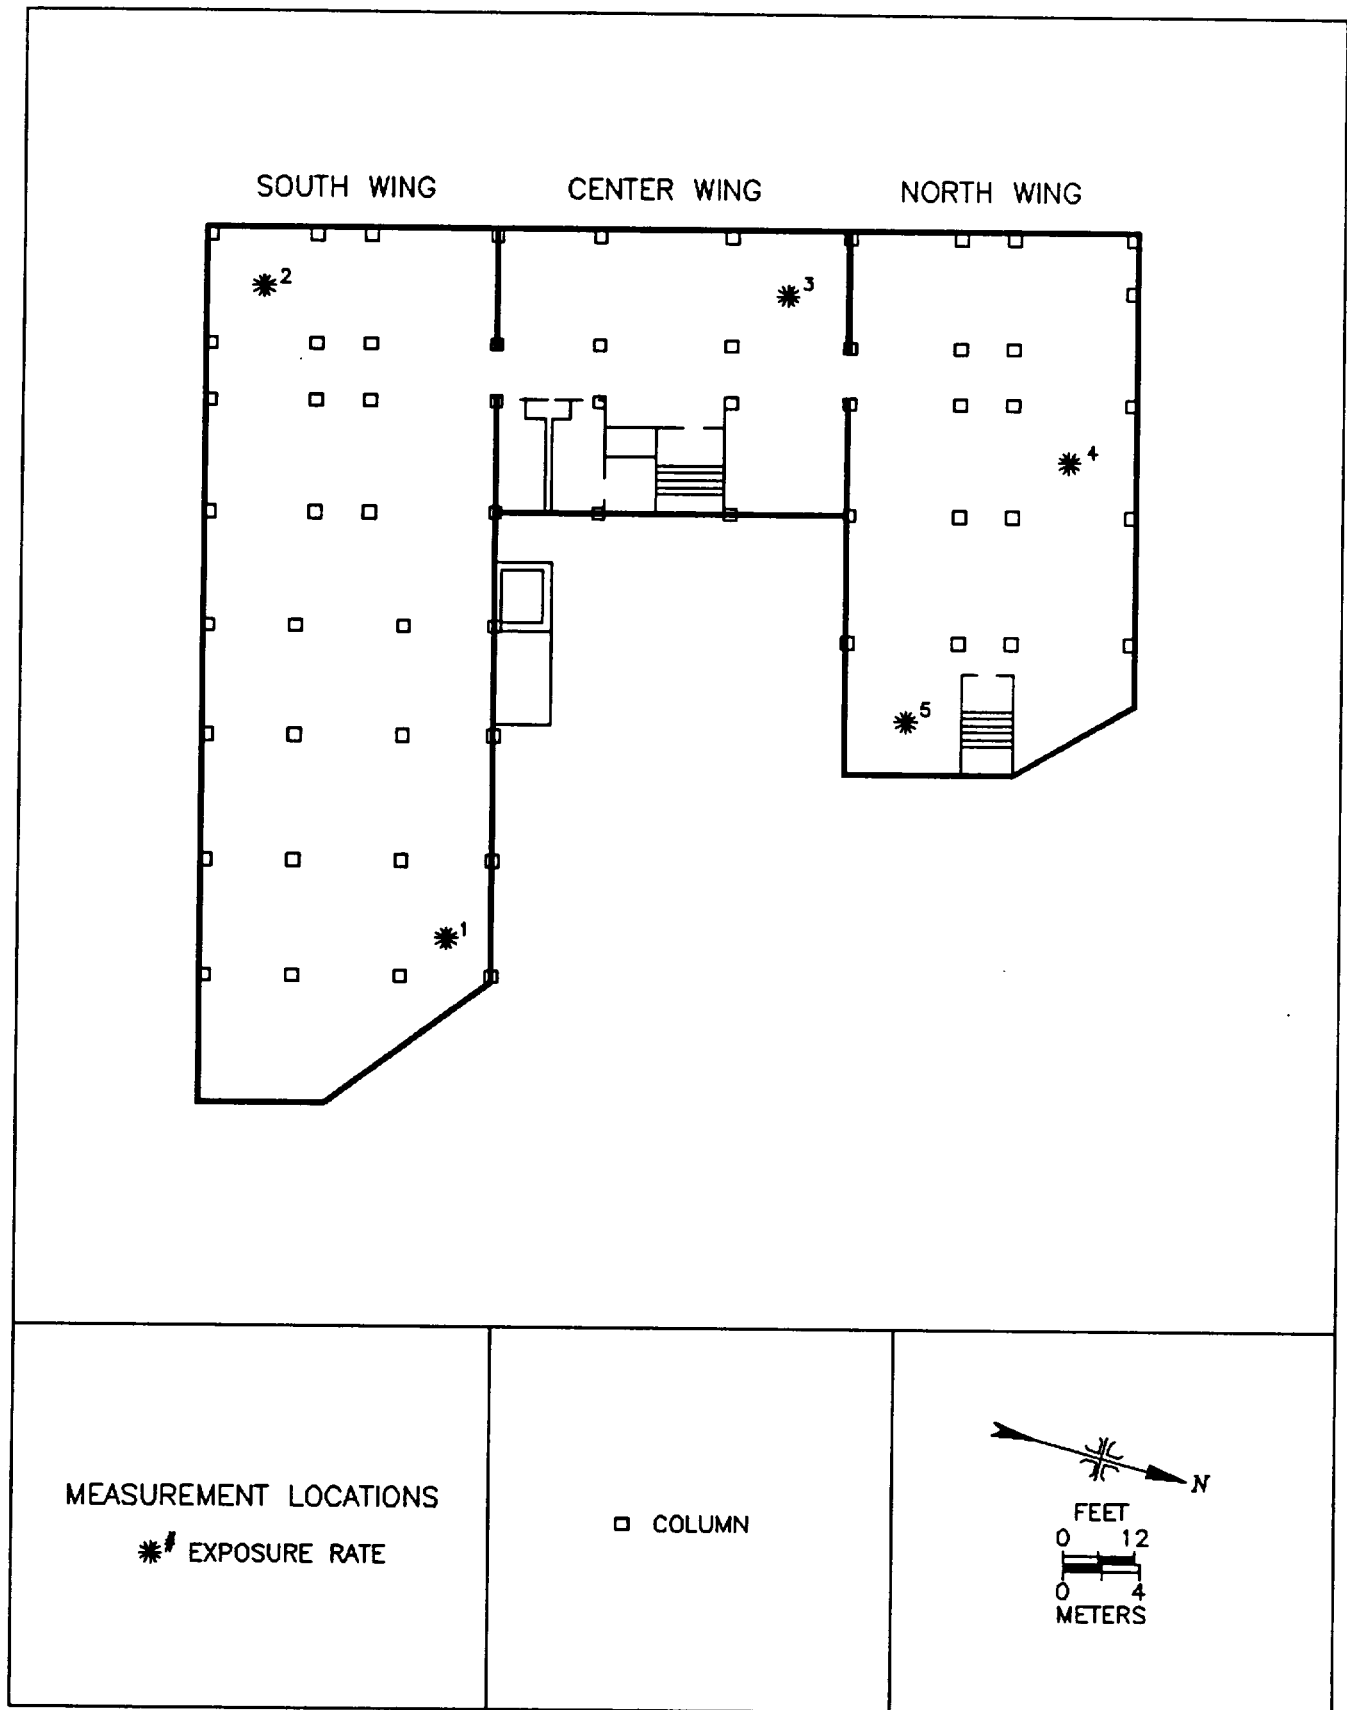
Building 7, First Floor — Exposure Rate Measurement Locations
